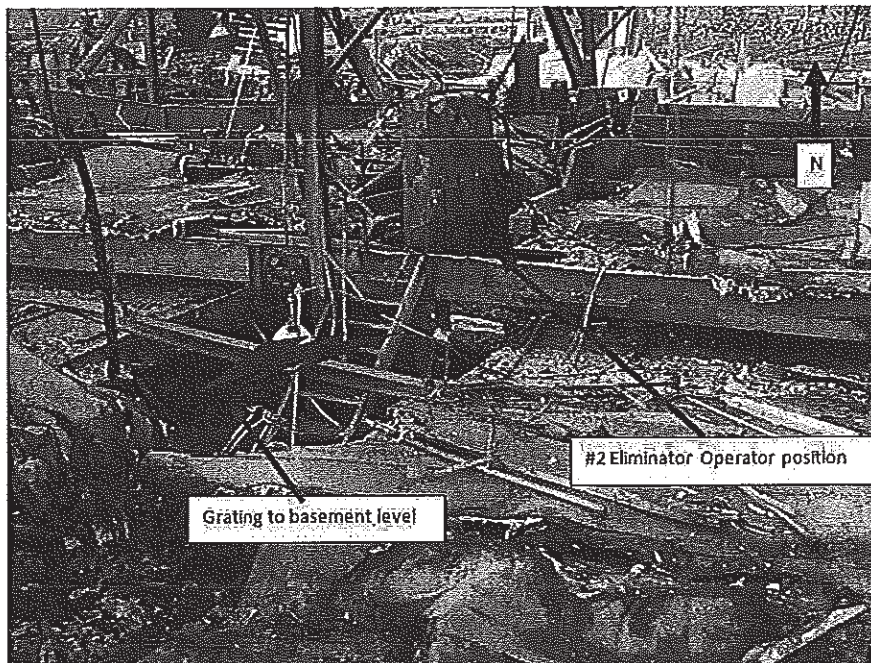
Photograph showing #2 Eliminator Operator's position and the path of the explosion.
